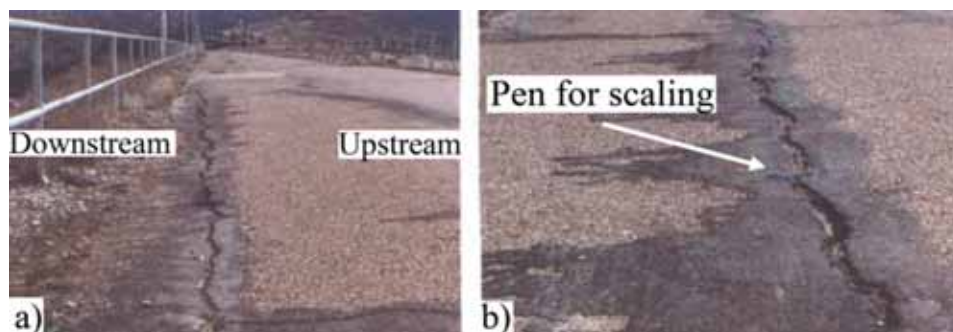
Stabilizing of cracks with grouting liquid asphalt
